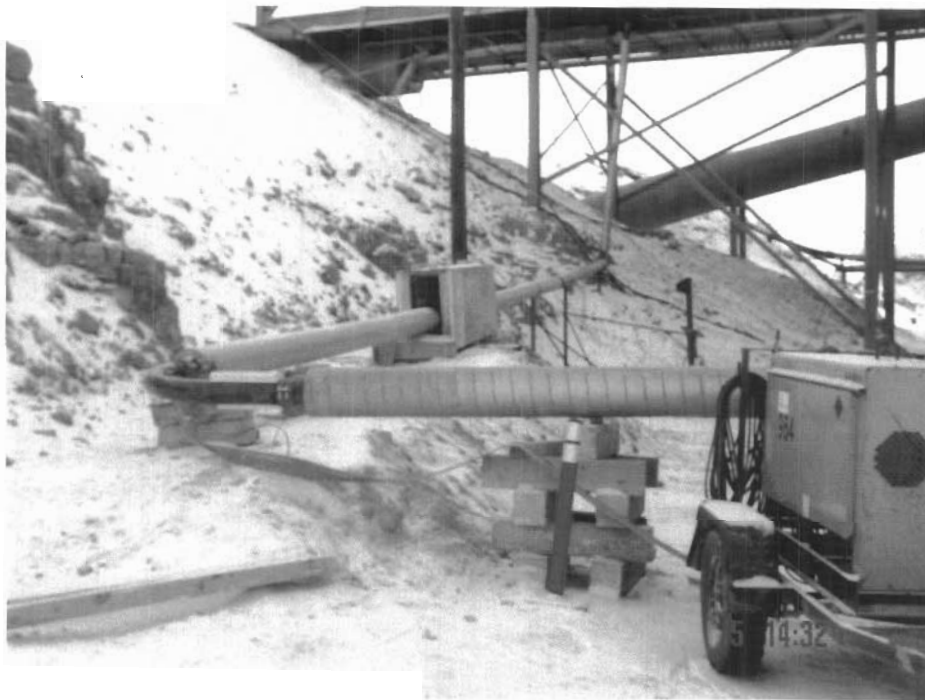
Sewage consolidation line located below Mill Barge complex main entrance.
